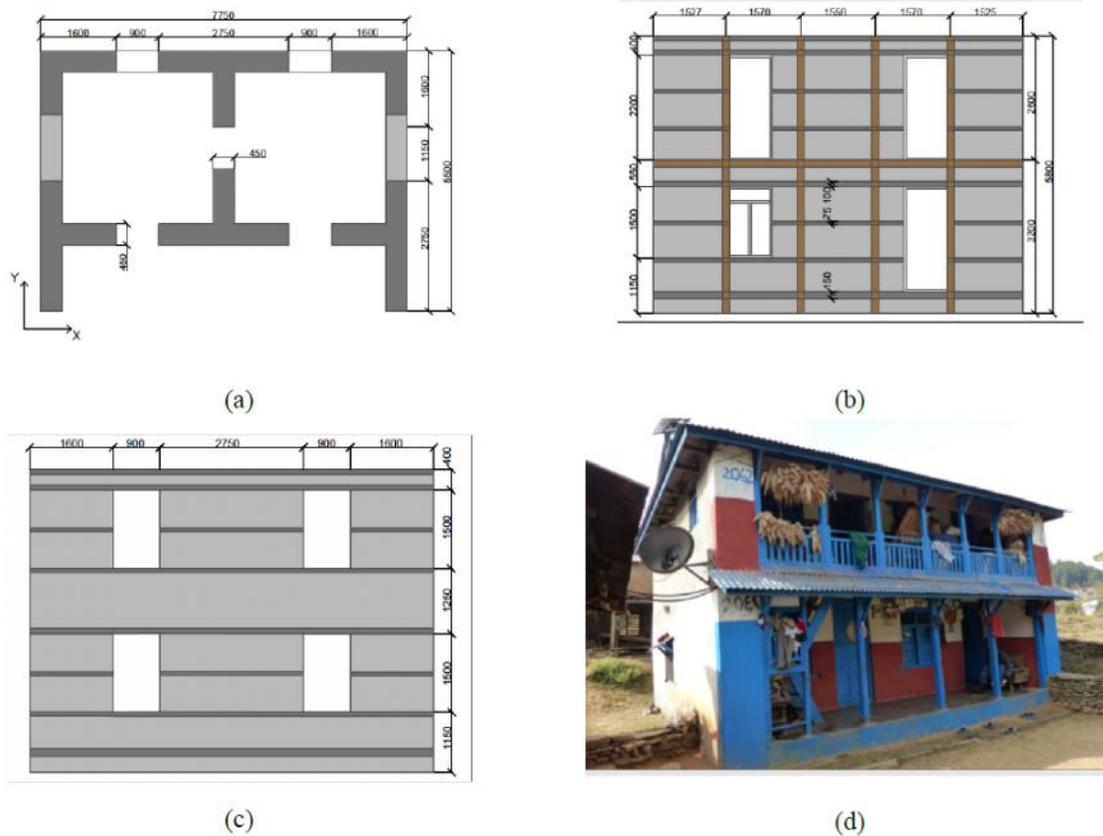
Two-story Smart Shelter template: (a) plan view of the ground floor; (b) front elevation; (c) back elevation; (d) photograph of a completed building in Nepal.
